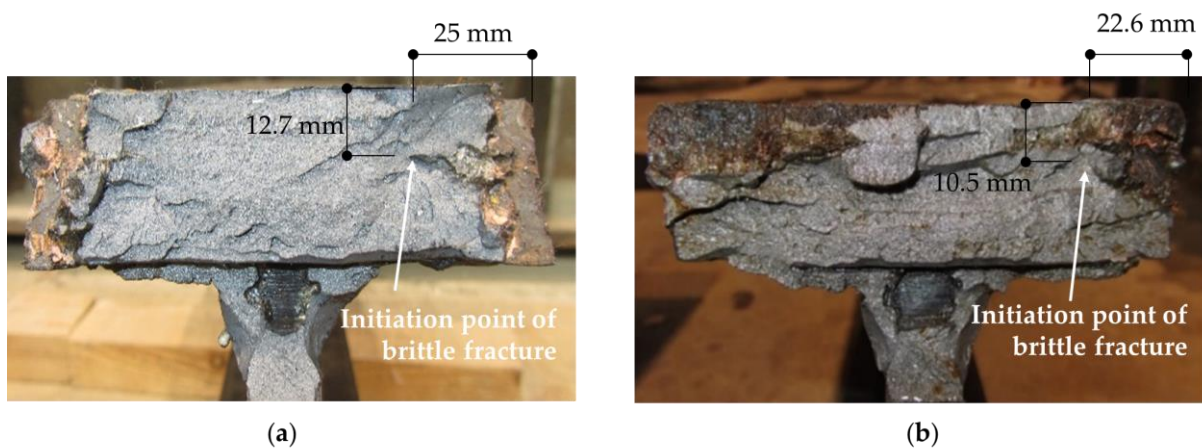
Fracture surfaces of the (a) FTC-8C and (b) FSC-14C specimens.
